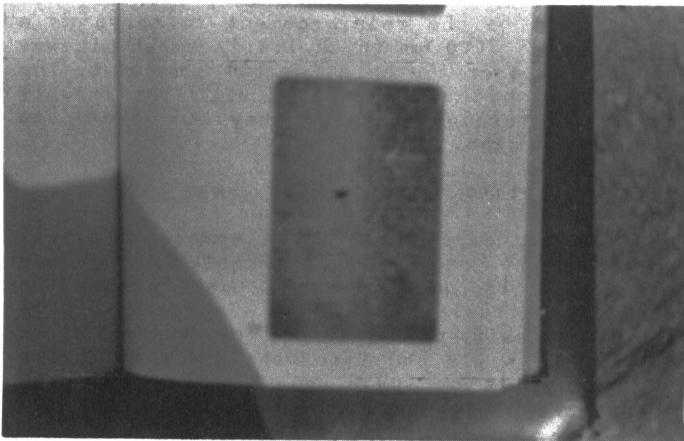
Cracks on Outer Walls - Case II
